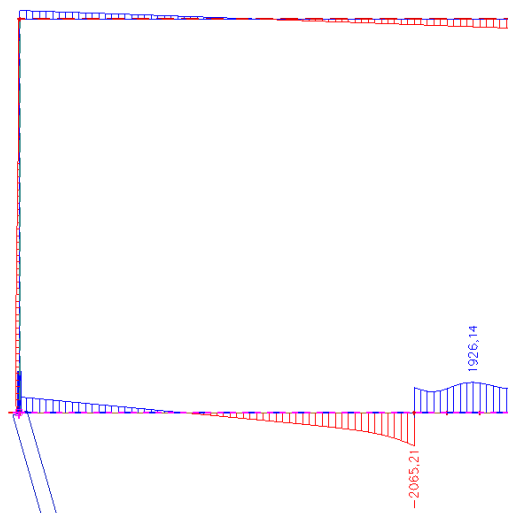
Shear force diagram, Load situation: High water, cross section between openings
